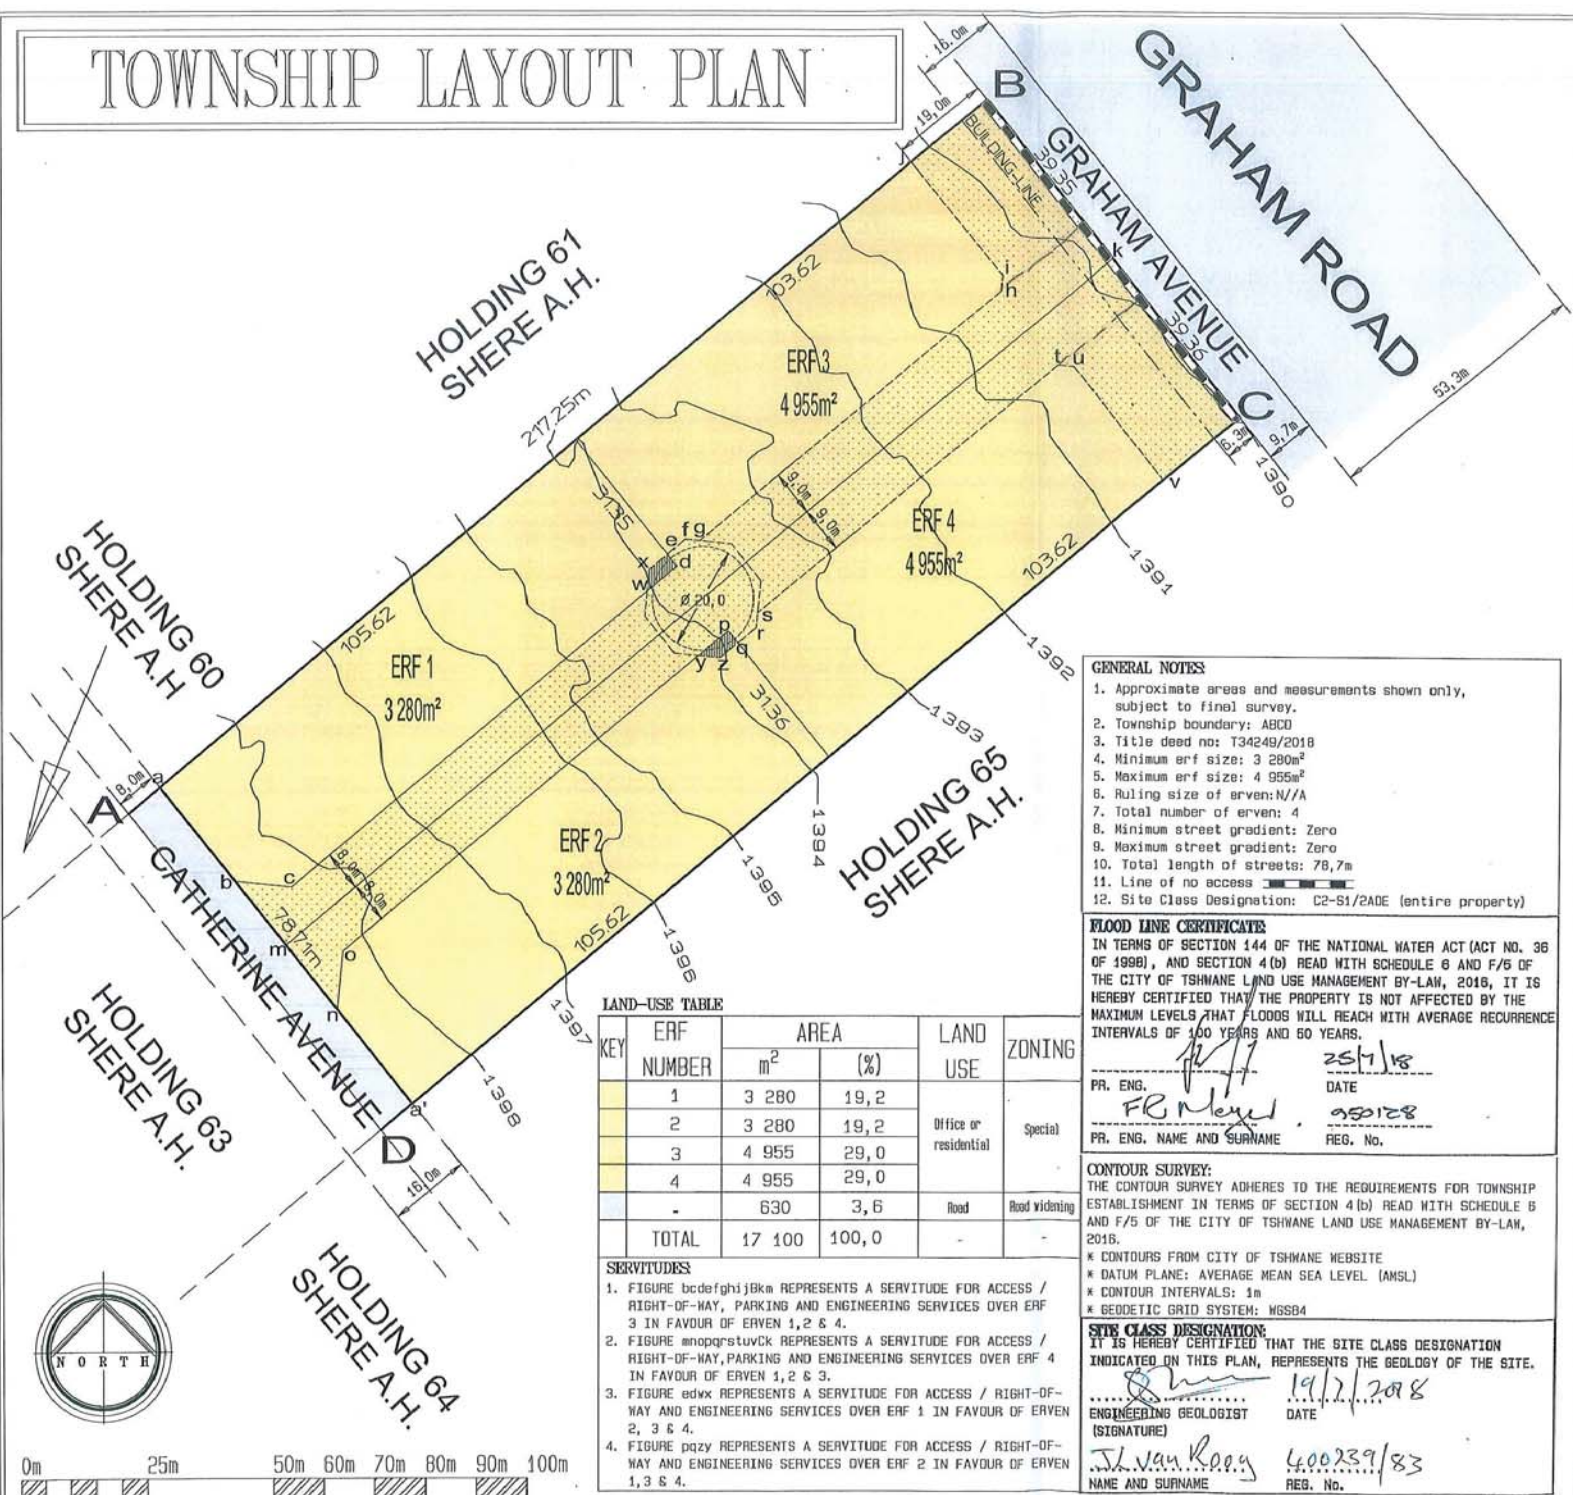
TOWNSHIP LAYOUT PLAN]
